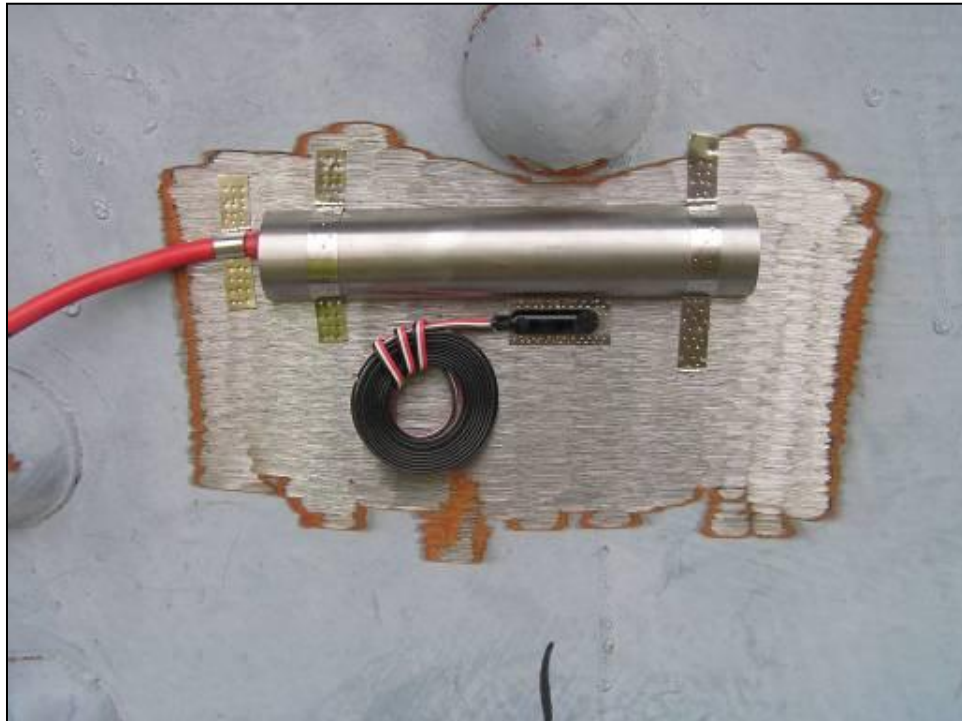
2" Vibrating Wire Gage with Cover and 1" Electrical Resistance Gage
